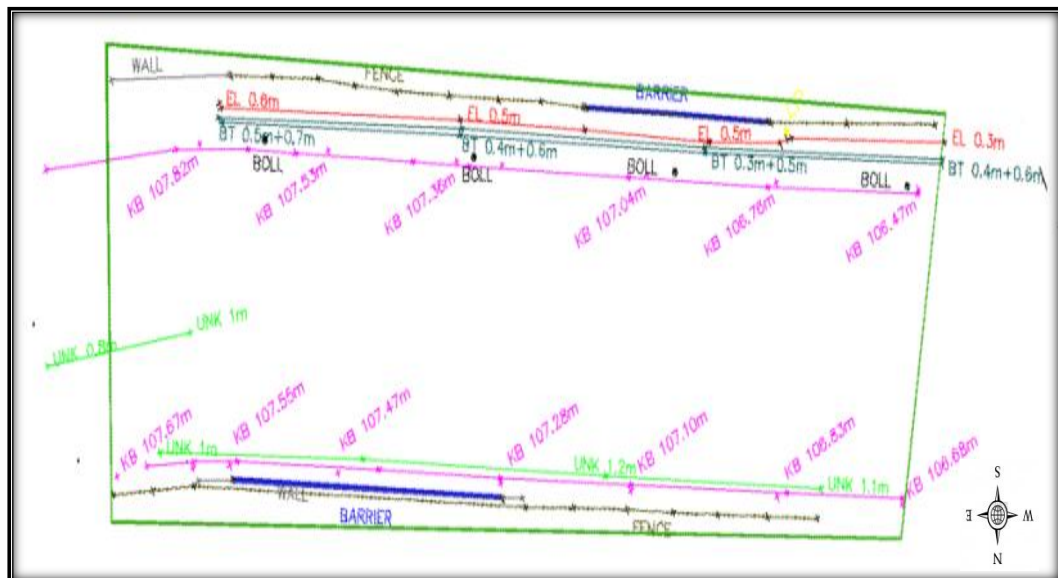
Beams locations shown on an AutoCAD Plan
